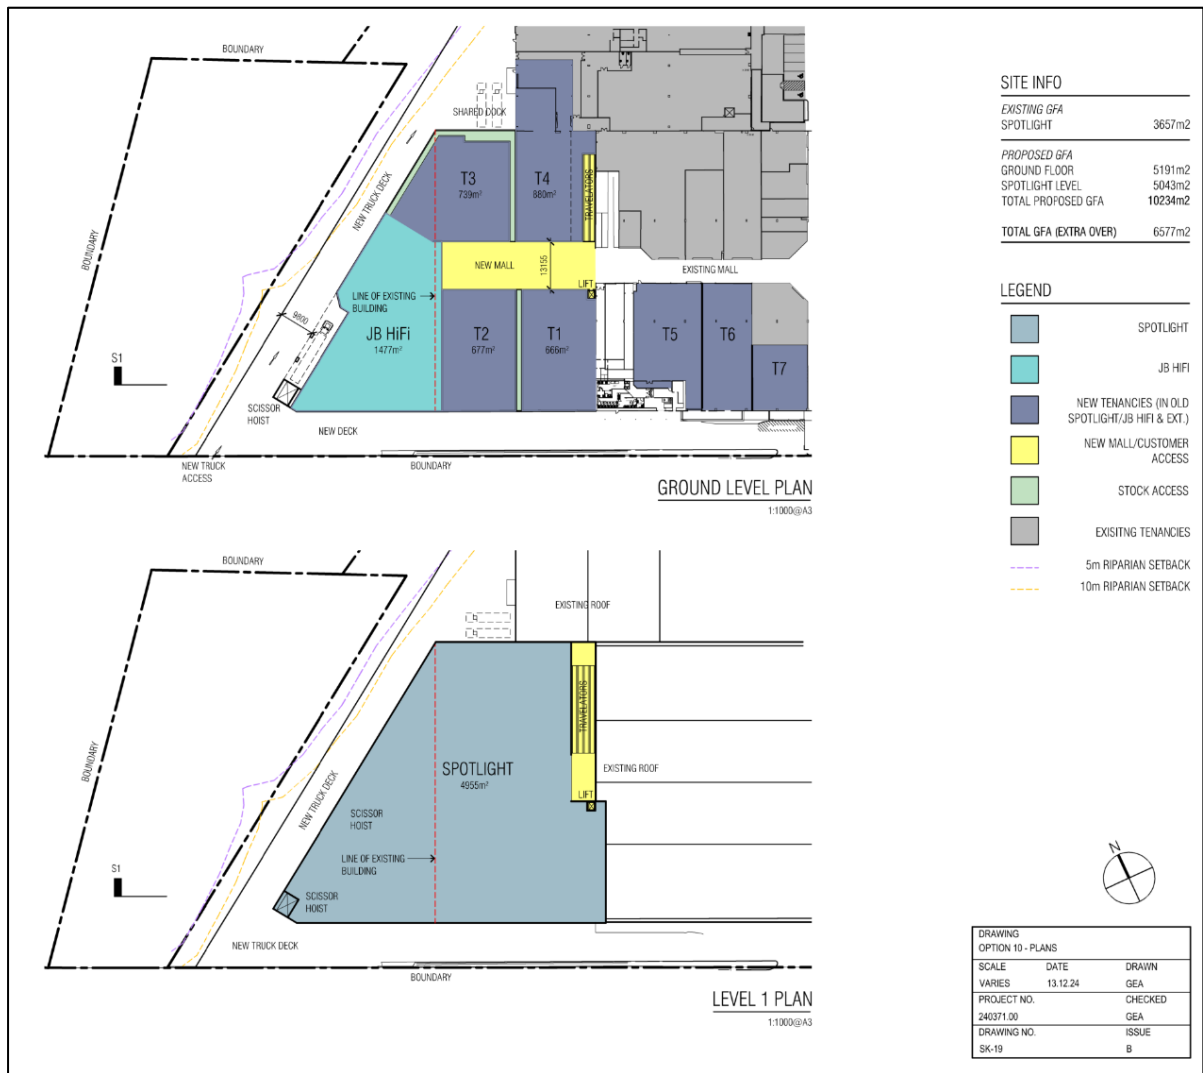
Preliminary concept plan of the proposed extension (Architectus)
